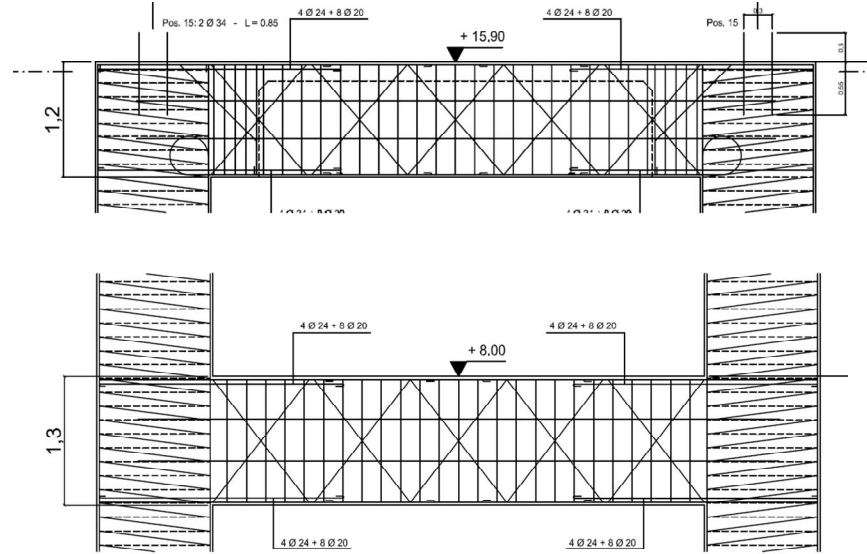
Reinforcement of cap and transverse beam and of the tall pier
